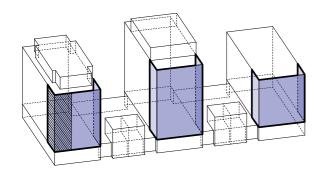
Detailed elevation study: bookend (A1 west facade)
